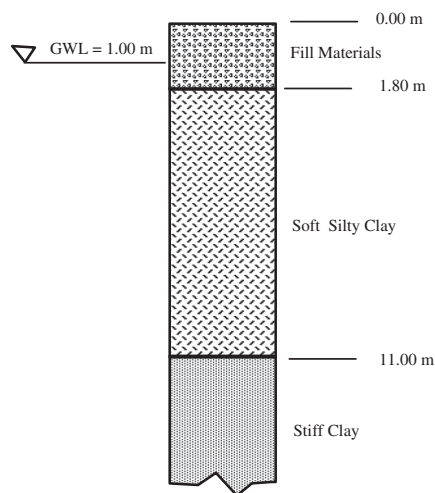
Profile of soil foundation at the site of Nantong Expressway project.
